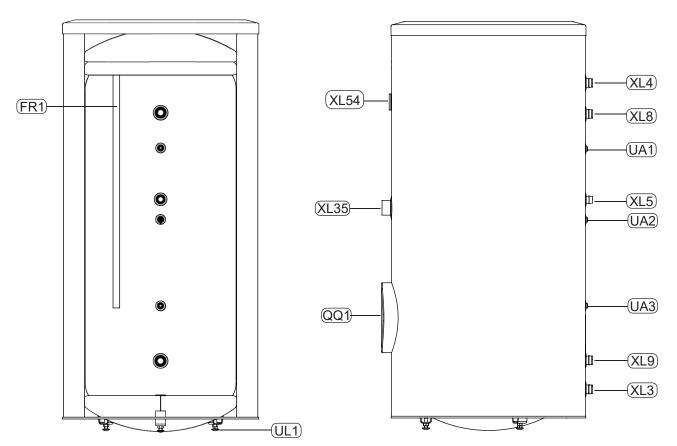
Section of the BA-ST 9075-9100-FE storage tanks.
